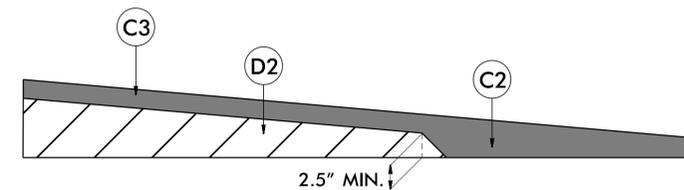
DETAIL SHOWING SHOULDER BERM GUTTER (SBG)
